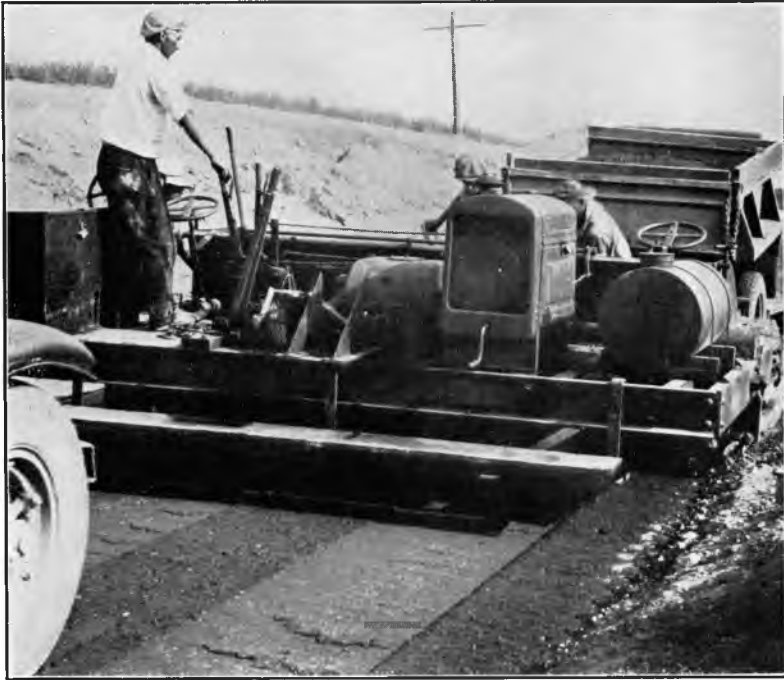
A stabilization project near Hagerstown, Indiana, illustrating use of an Adnun paver in placing plant-mixed material transported in trucks.
